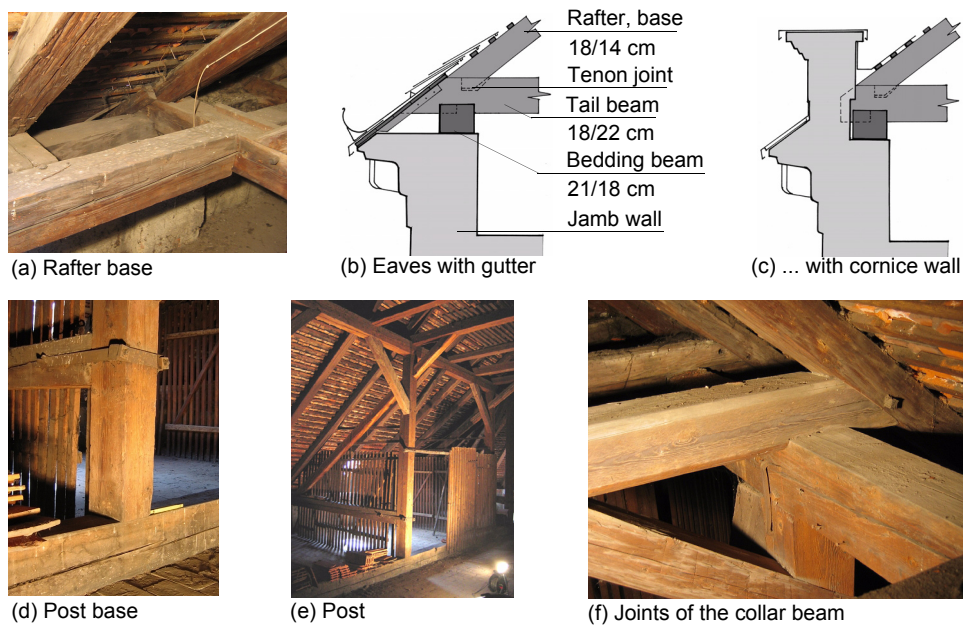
Typical joint of the „Grazer Dachstuhl“.
